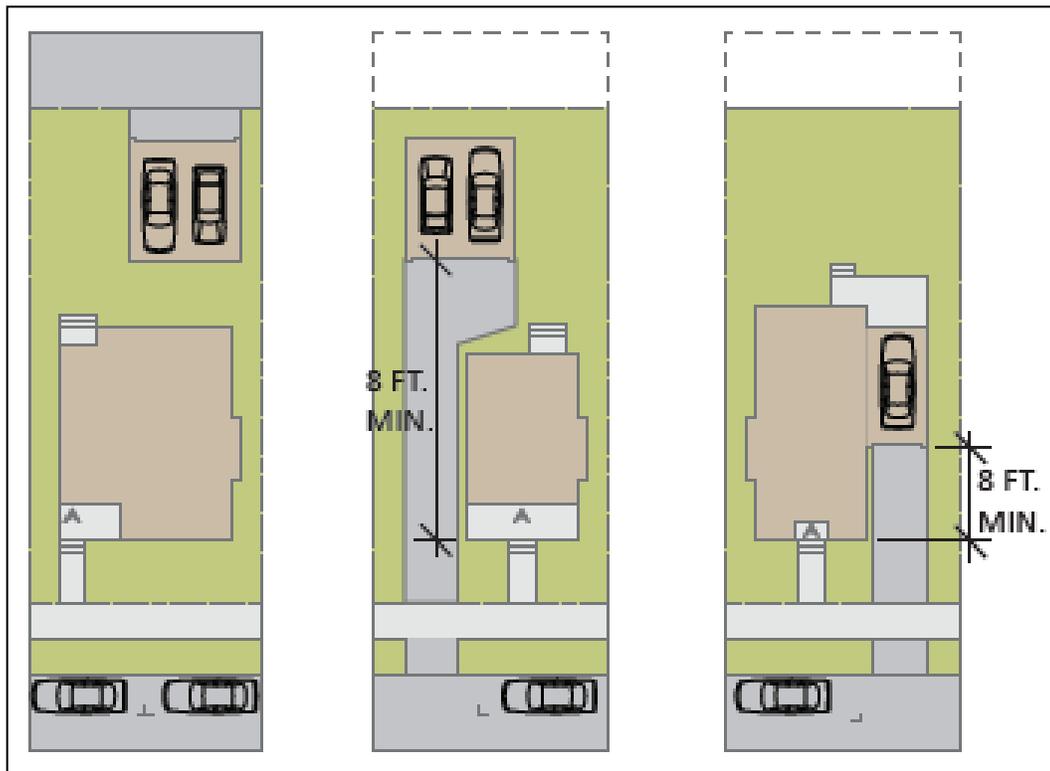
Accessory Building (Garage or Shed) Location on Lot
